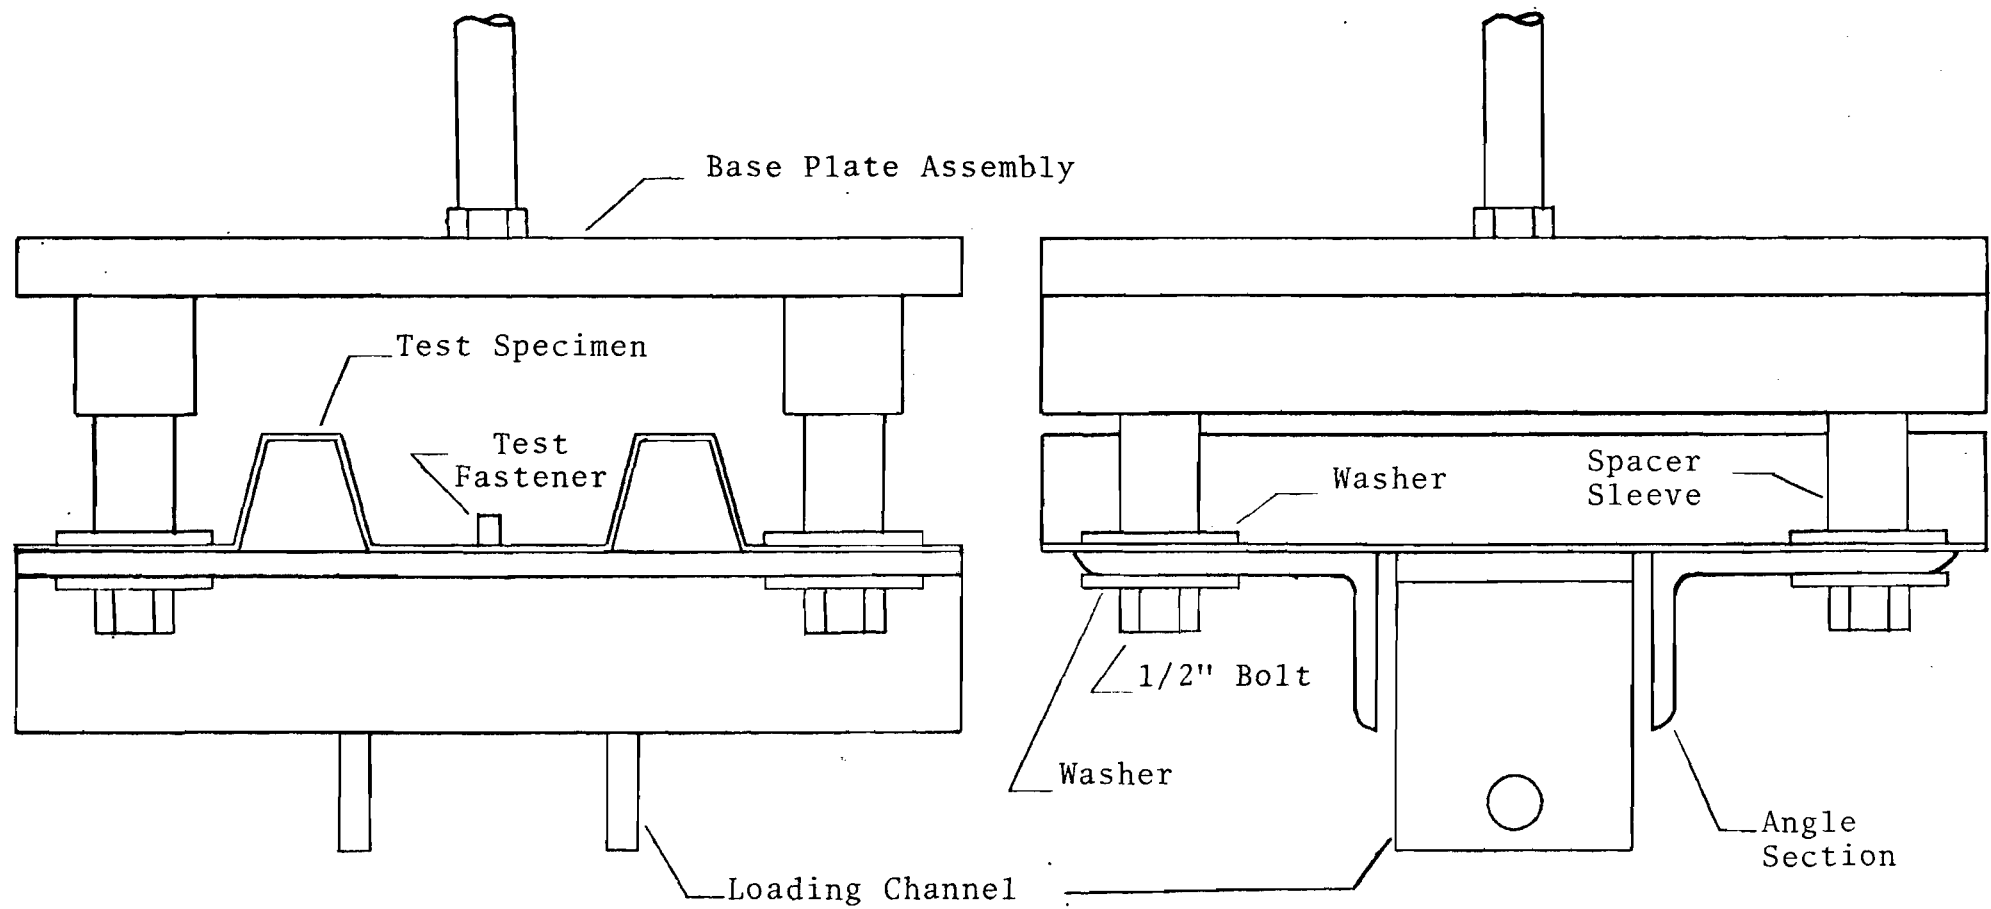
TEST SPECIMEN INSTALLATION FOR UPLIFT TESTS WITH FLEXIBLE CORRUGATED SPECIMENS
